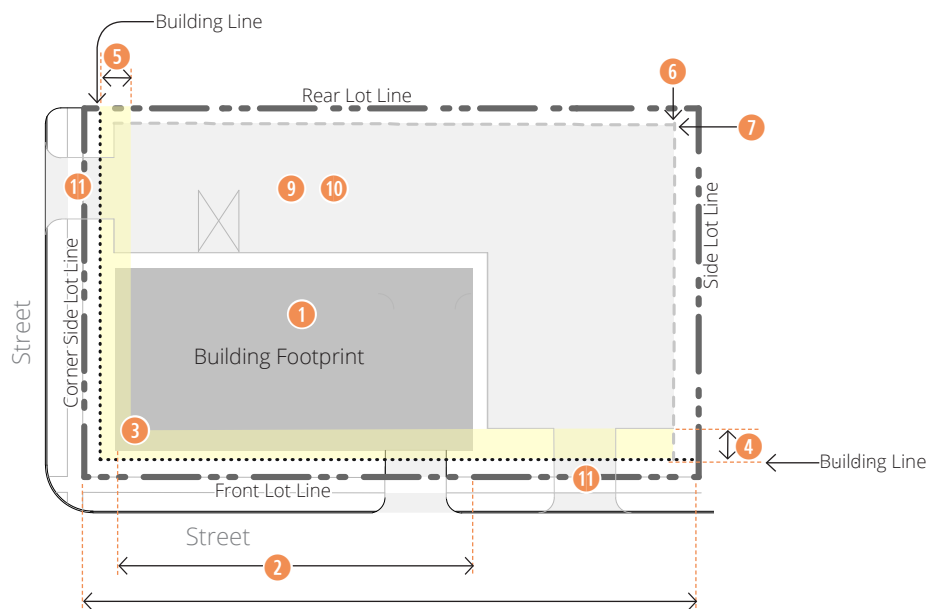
B Workshop/Warehouse Building: Building Siting
